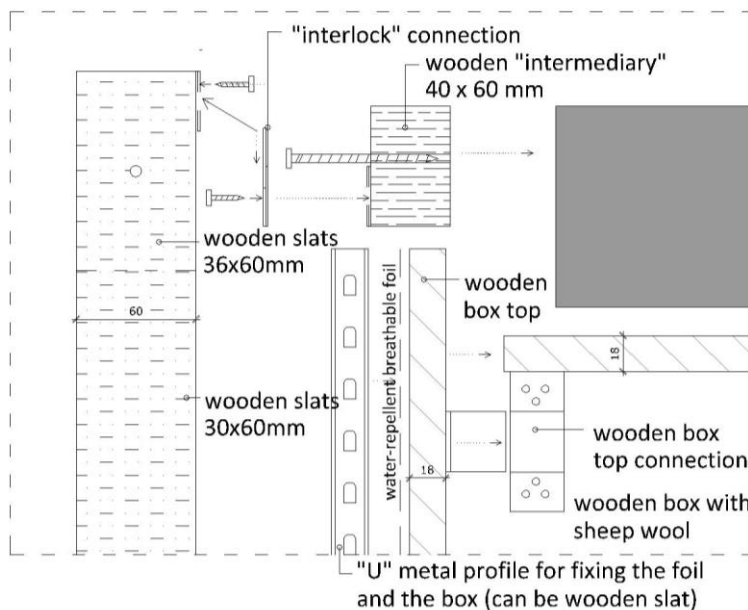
2D exploded detail of the wooden box top and hanging façade slats panel. (source: 4D architects).
